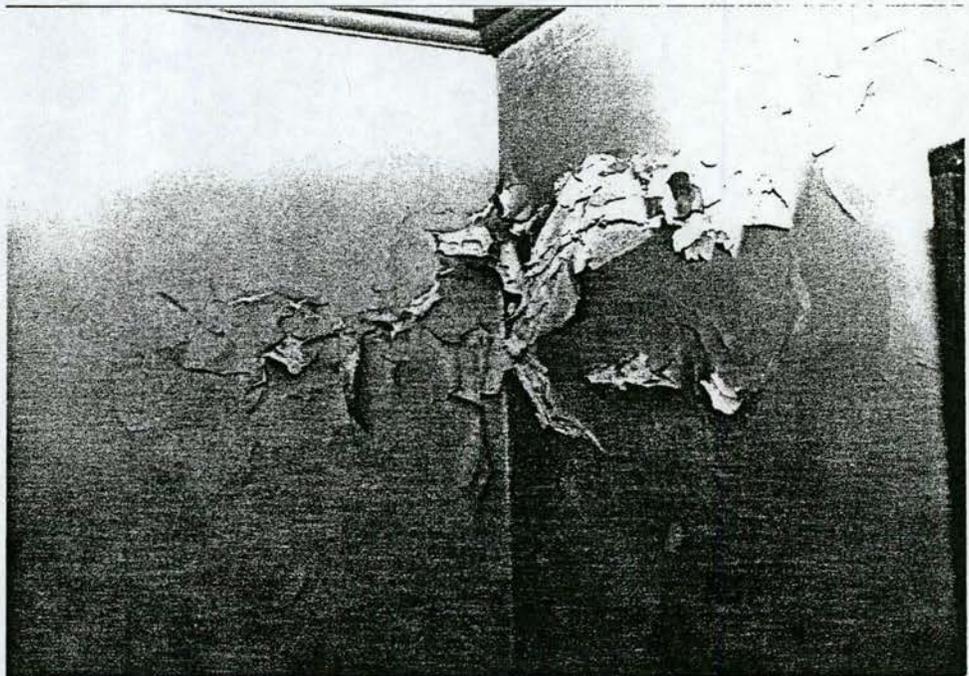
Note deteriorated plaster and peeling paint adjacent to internal roof drain.
